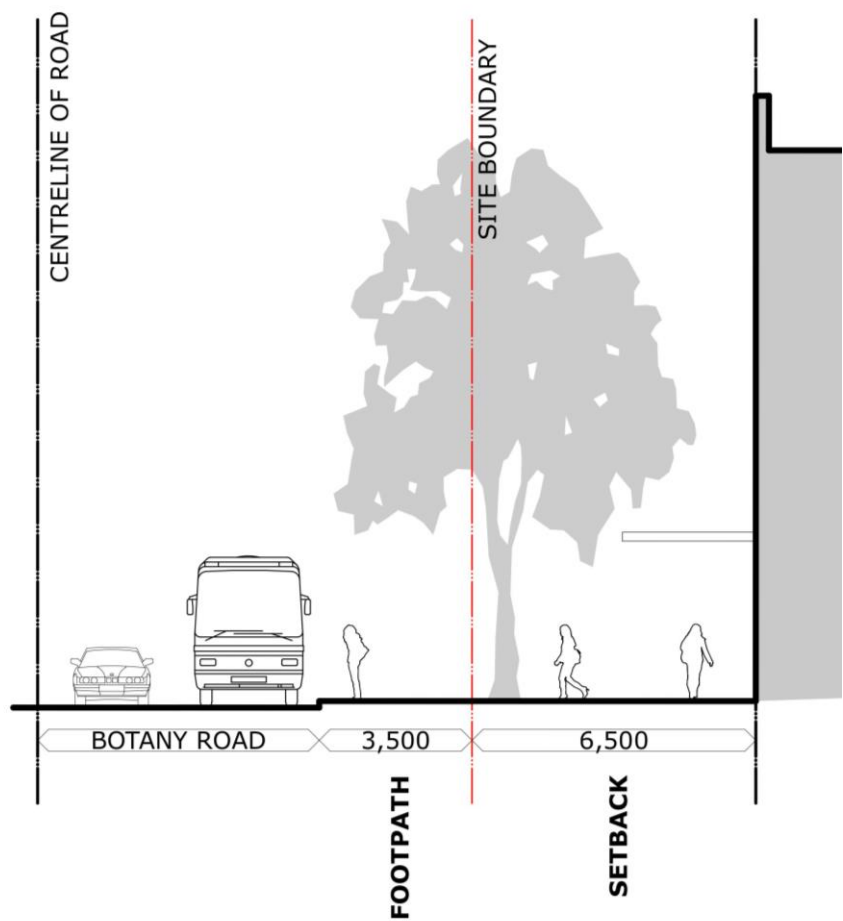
Section B - B – Main Street Typical Section – Botany Road (Bus southbound interchange)
